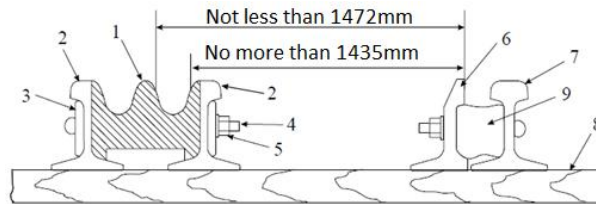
Distance between checkrail and crosspiece core, between checkrail and flap working surfaces: 1 – cast core, 2 – flap, 3 – plate, 4 – bolt, 5 – nut, 6 – checkrail, 7 – rail, 8 – sleeper, 9 – insert [1]
